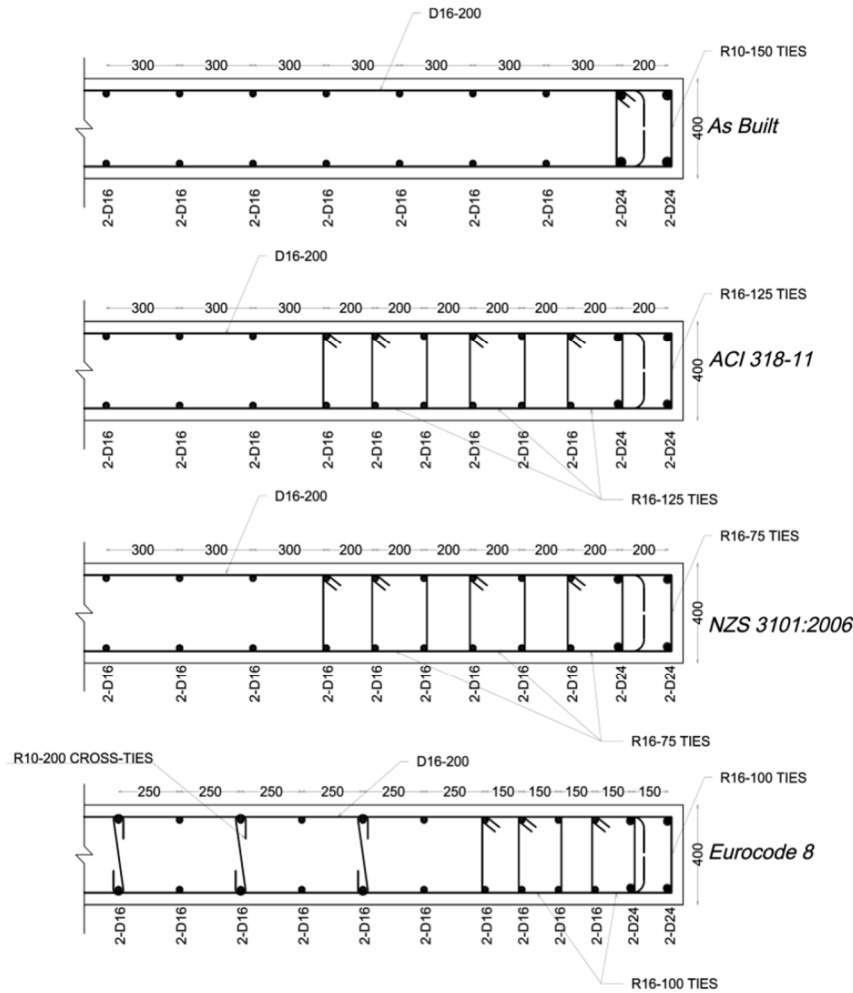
Wall Sections, Dashti and Dhakal (2013)
